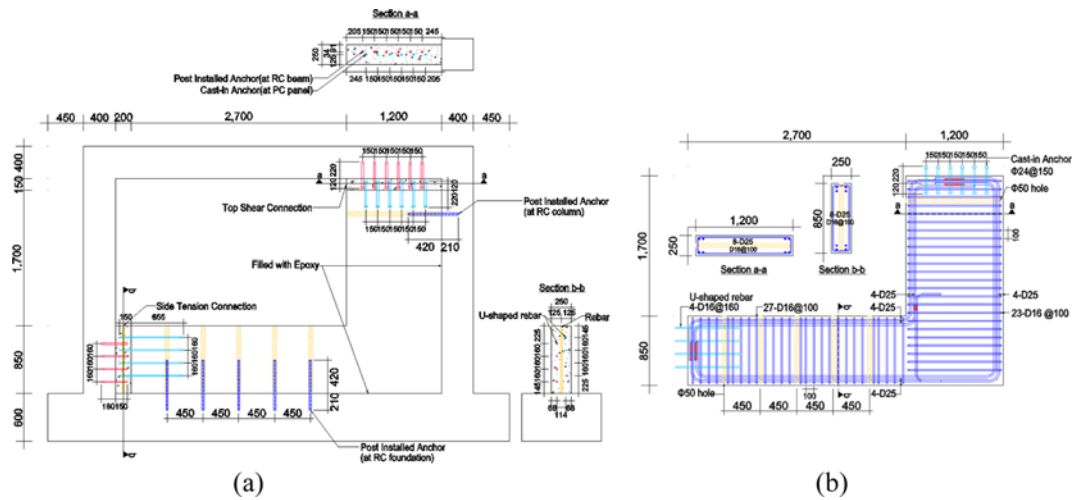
Dimensions and Reinforcement of Specimen LA1-H1V5 (mm): (a) RC Frame with PC Wall Panel, (b) PC Wall Panel
